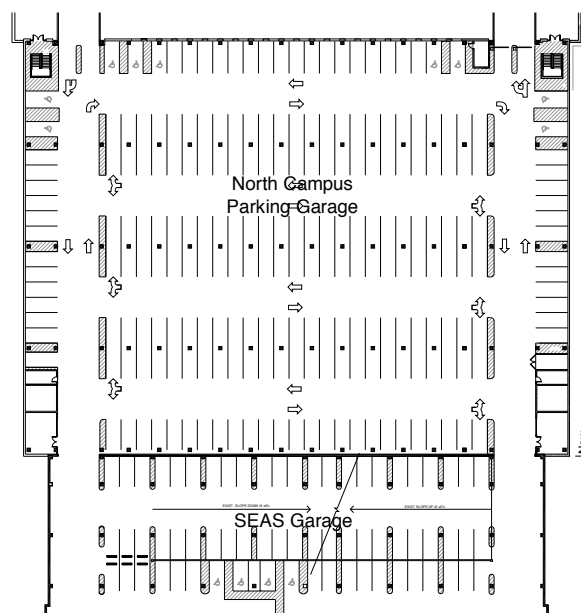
Parking level plan by 360 Architects. Note the grid for the new garage was set to assure the drive lanes line up.
